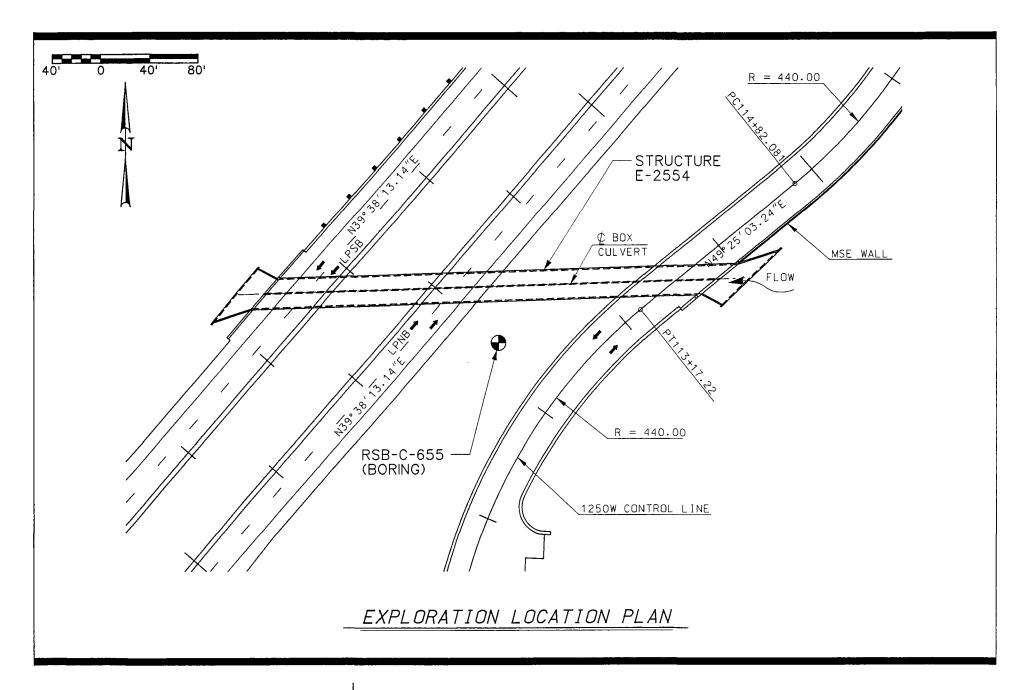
SITE PLAN & TEST HOLE LOCATIONS
